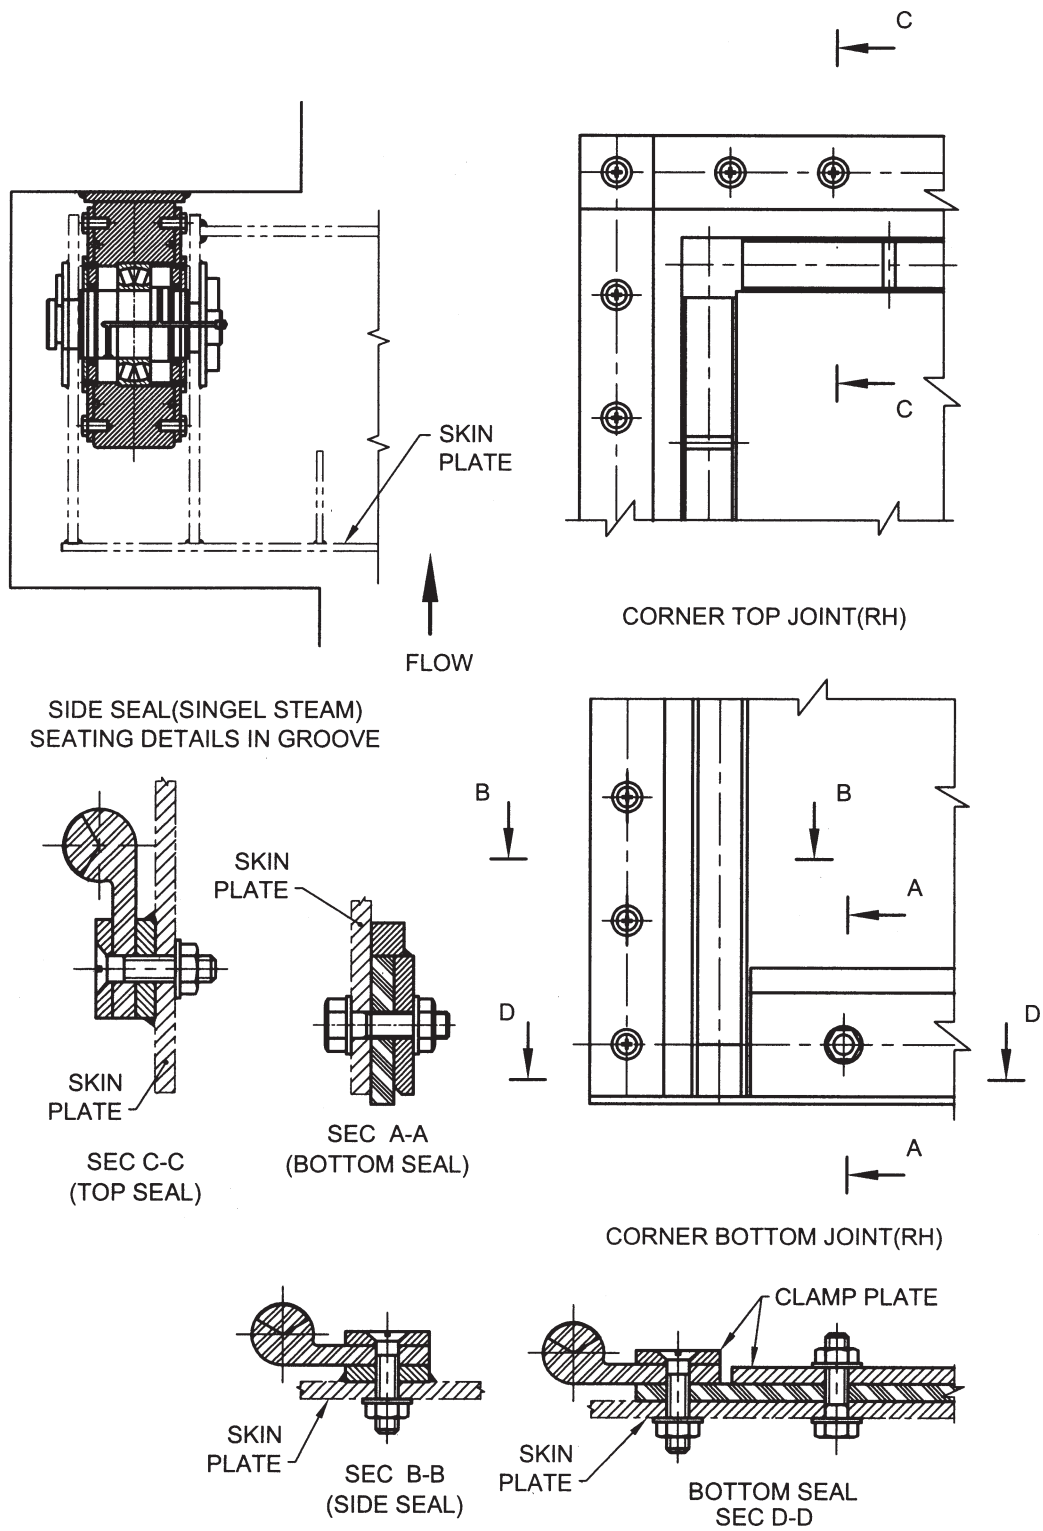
Side, Top and Bottom Seal Joints (Up Stream)
